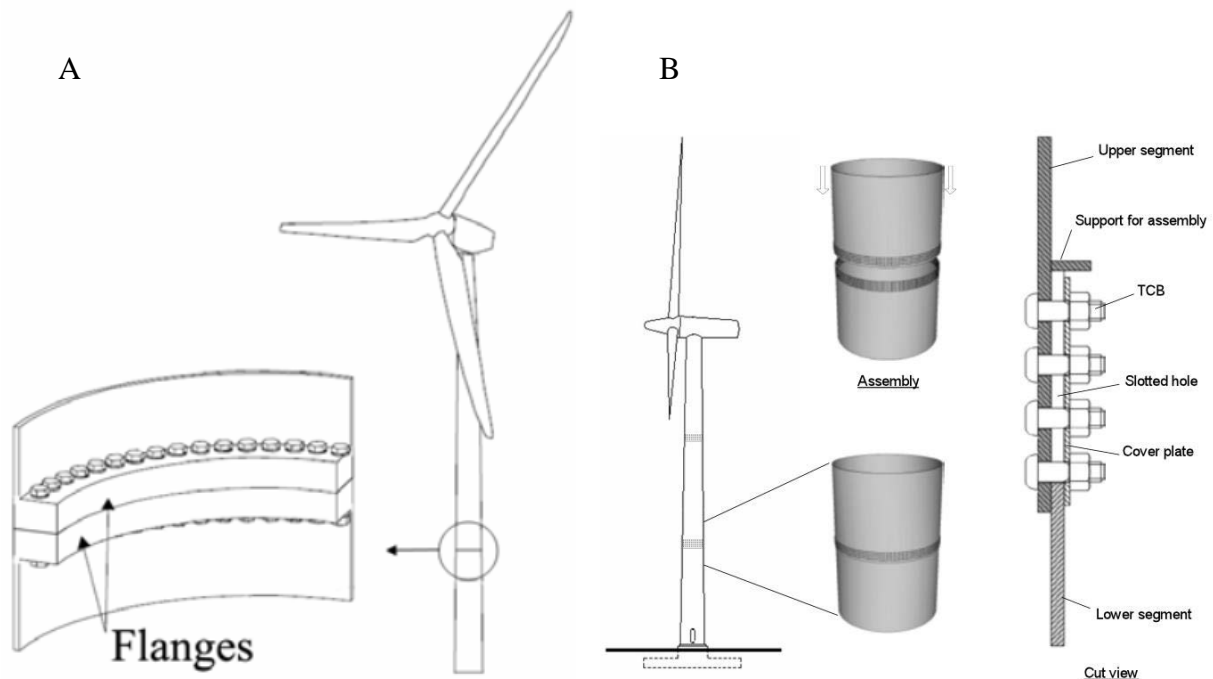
Different methods for the assembly of the tubular segments A) traditional welded flange bolted connection (Heisterman, 2011) B) Friction connection (Histwin, 2012)
